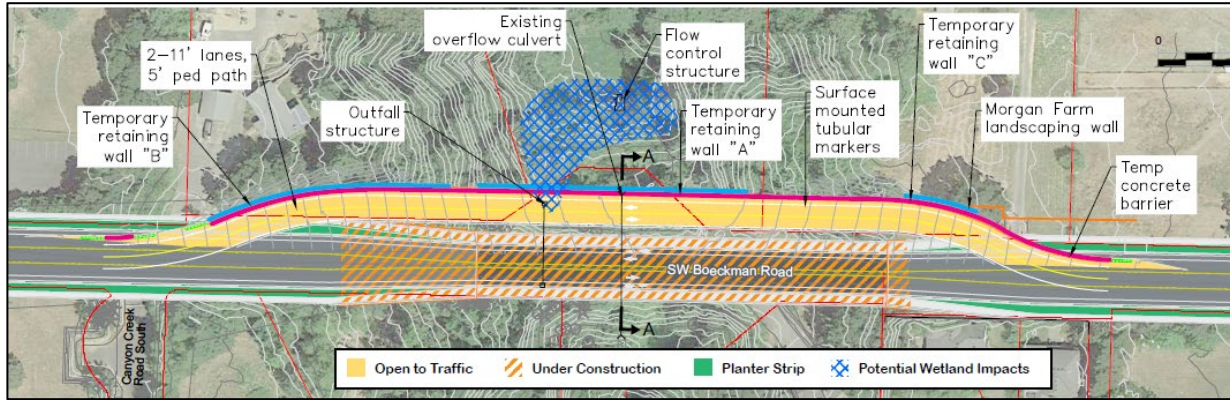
Preliminary design of northern on-site detour, shown with the bridge alternative:
